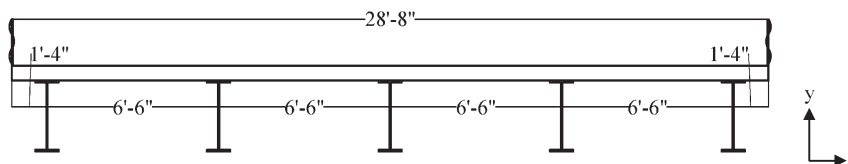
FRP deck-on-steel girder bridge cross-sections of models 5,6,7, and 8
